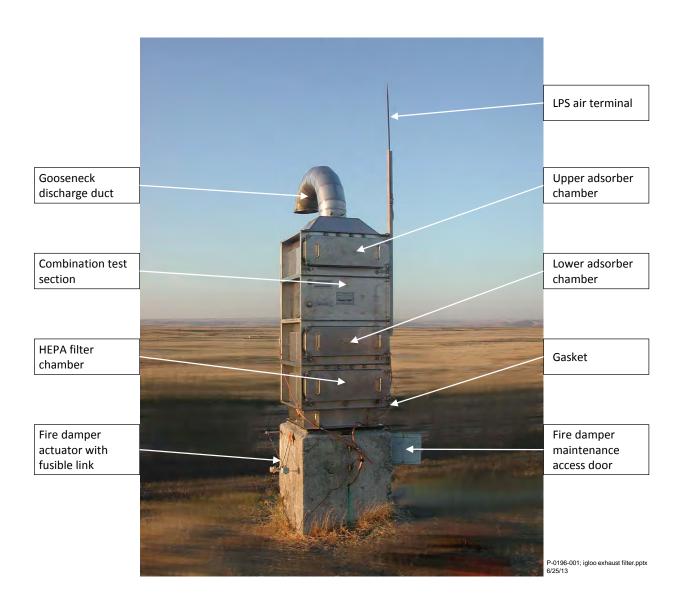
Igloo Exhaust Stack Door with Filter System Installed
